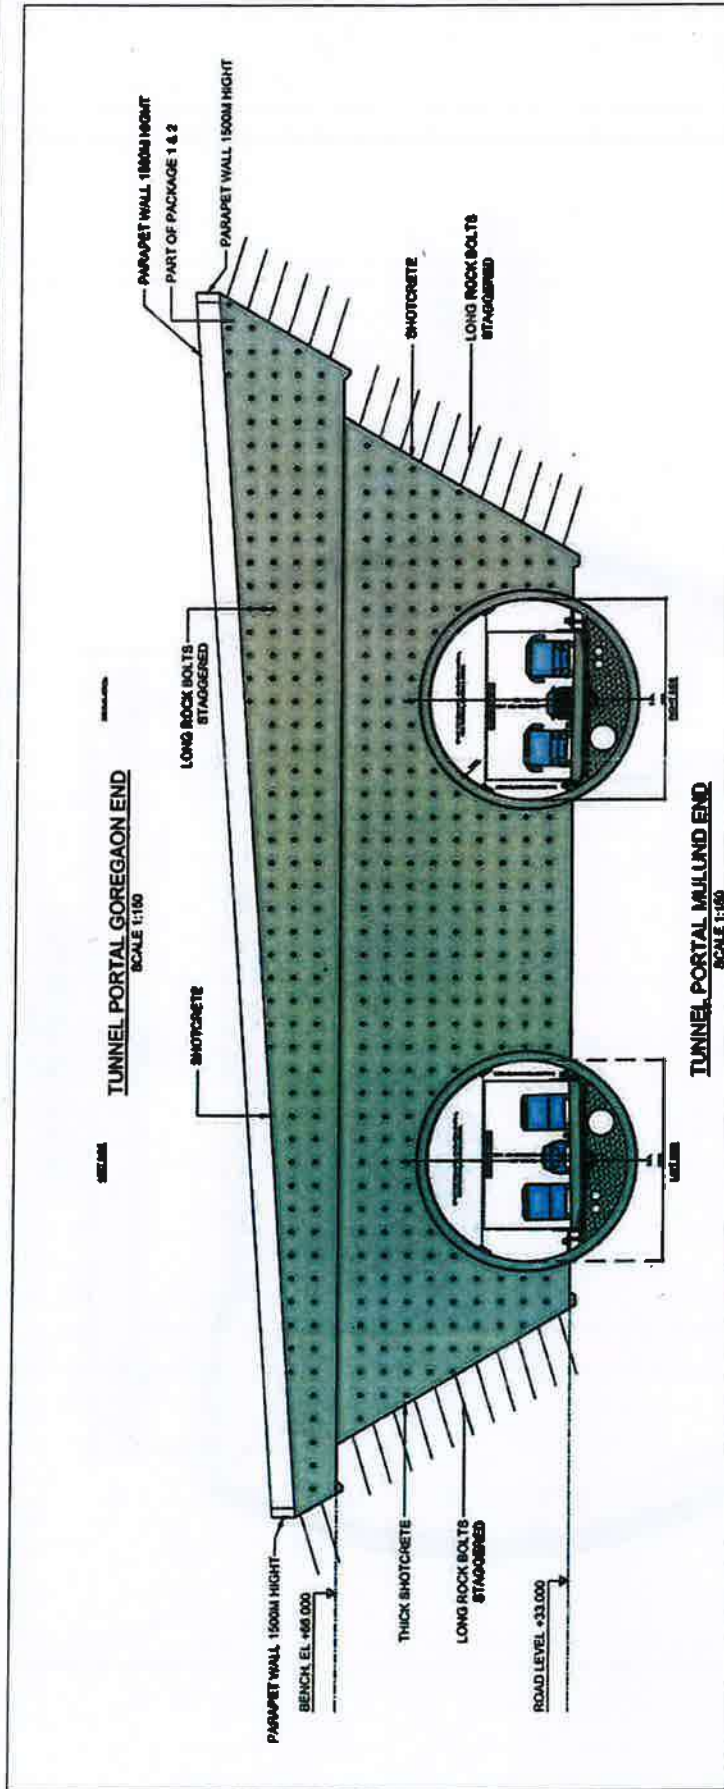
Tunnel Cross Section-Tunnel Portal Goregaon End
